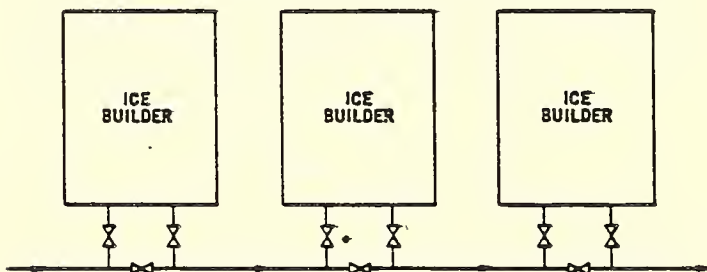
Multiple Ice Builder Water Piping, Series Arrangement
